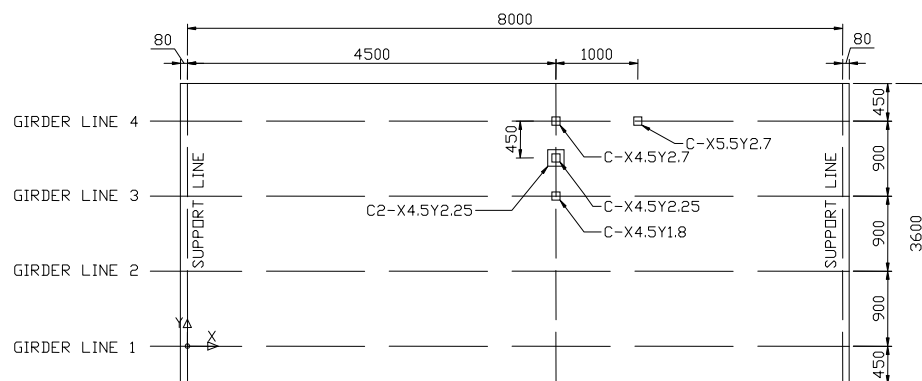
Plan view of bridge deck, showing the locations of damage to the concrete deck (dimensions in mm).
